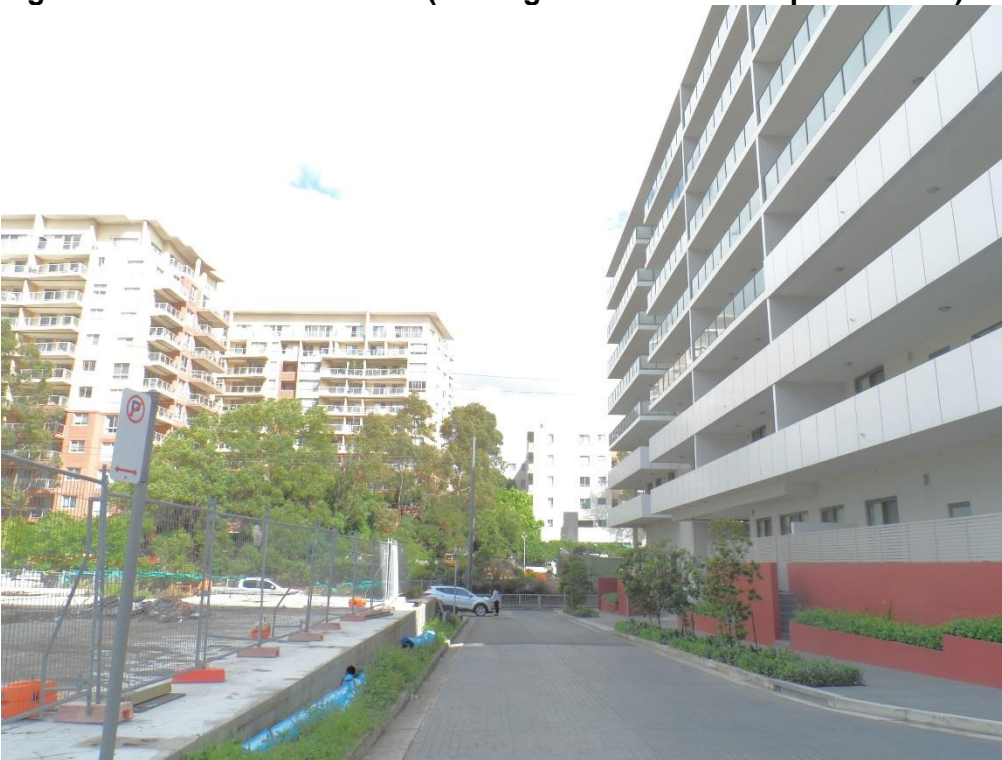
Site and Surrounds (looking north west from Columbia Lane)
